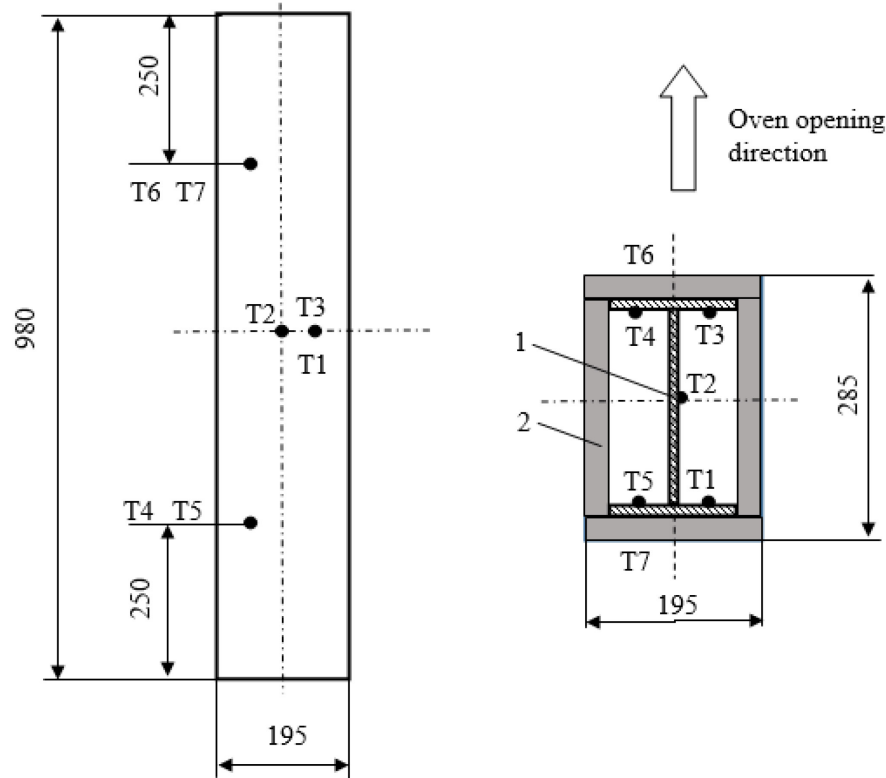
Schematic representation of the insulated I-beam and of the layout of thermocouples set on it: 1 - I-beam; 2 fire-retardant cladding (magnesite plate); T1-T3 - the main thermocouples for the I-beam; T4-T7 - additional thermocouples for the I-beam
